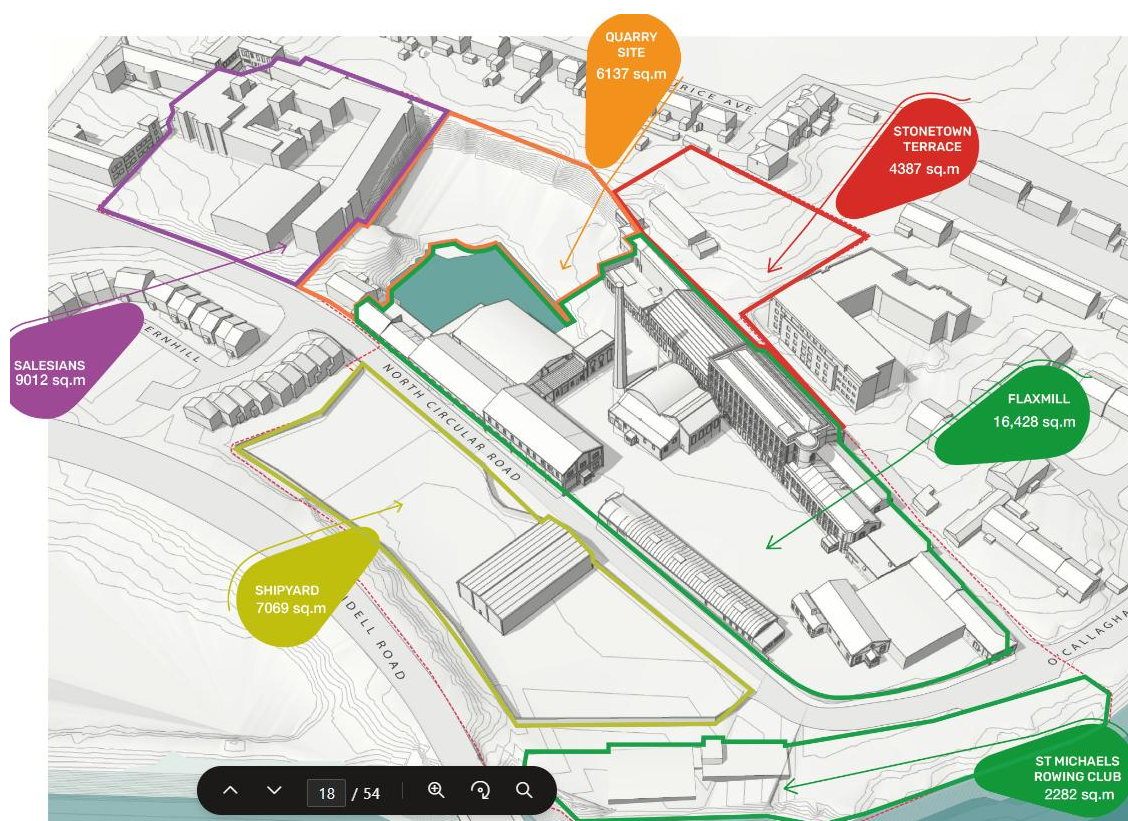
Six Development Zones with the Overall Masterplan Site
